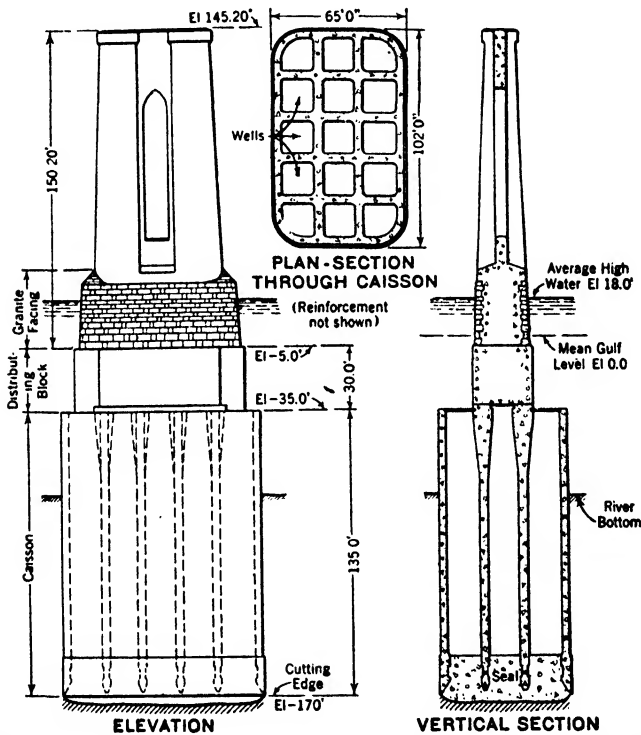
Reinforced-concrete Open Caisson with Dredging Wells of the New Orleans Bridge. (Courtesy of Civil Engineering.)
